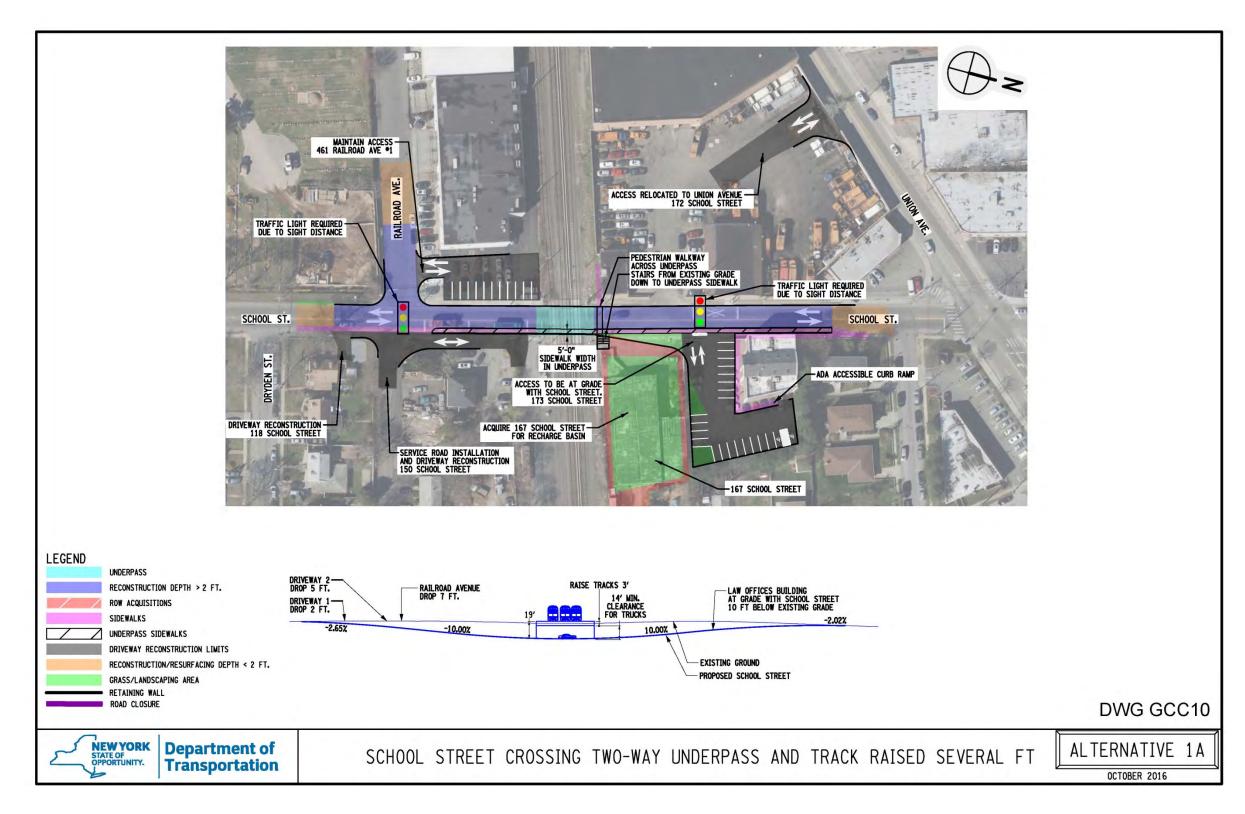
School Street Crossing (Alternative 1A: Two-Way Underpass and Track Raised Several Ft)
